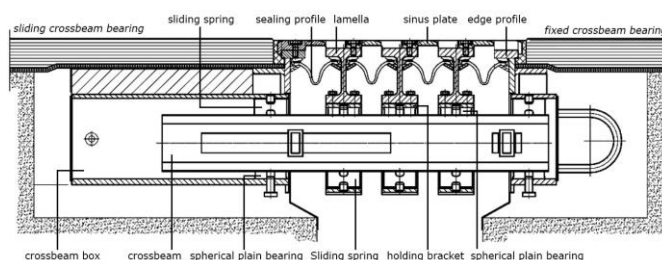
Commented section of an exemplary modular expansion joint construction. Source: mageba sa
